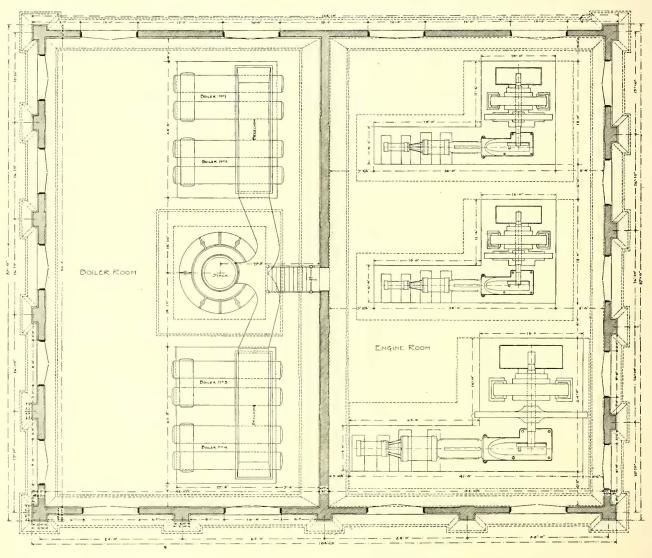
PLAN OF STATION AND FOUNDATIONS.
